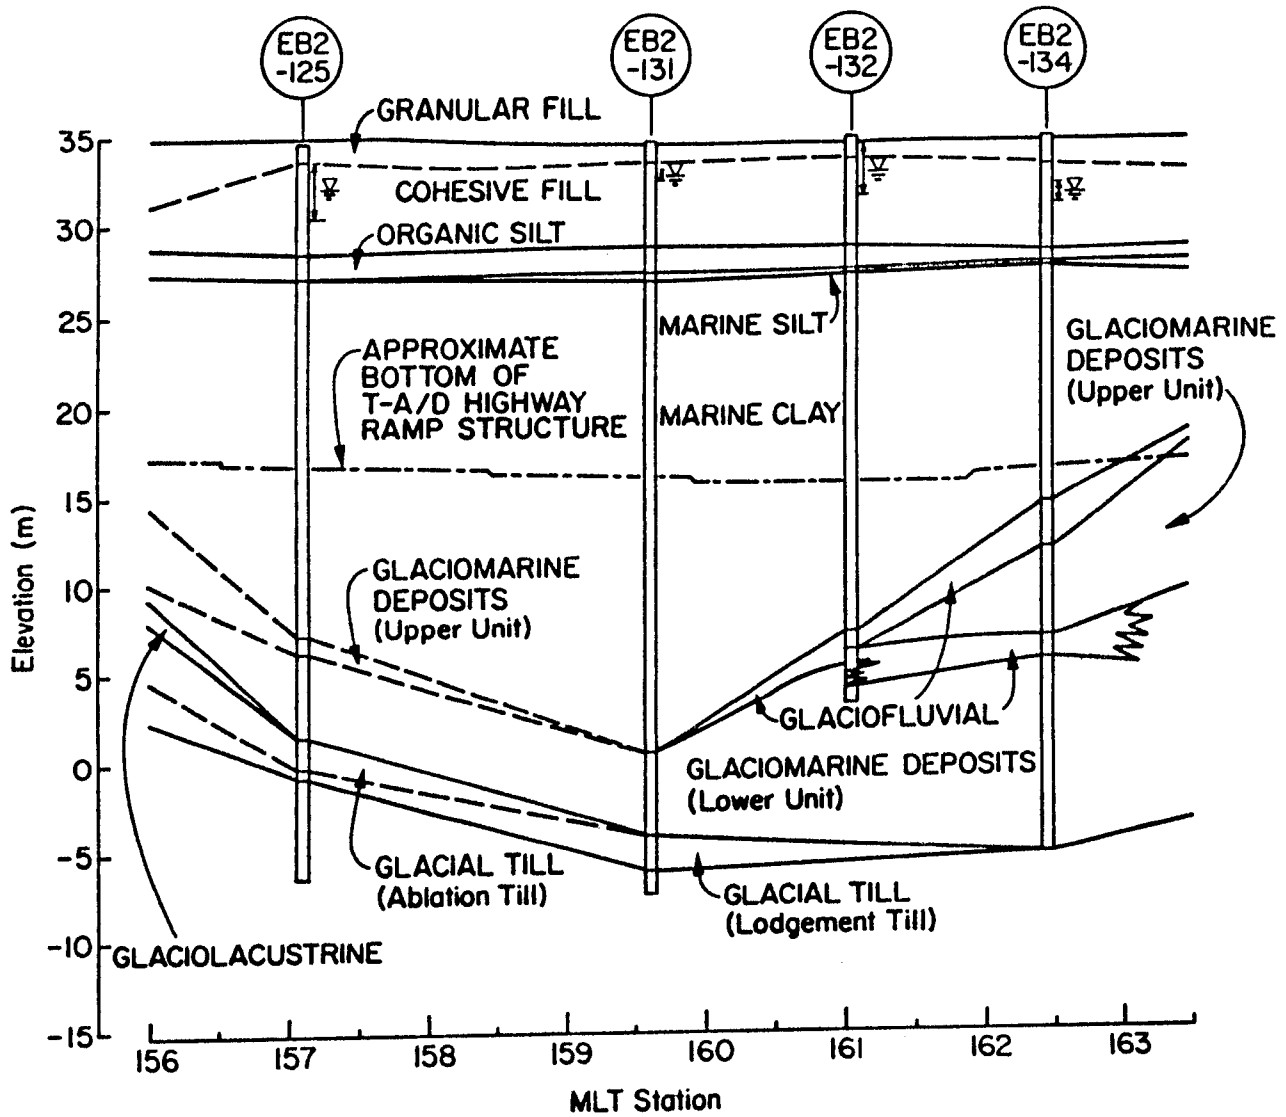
Longitudinal soil profile for MLT stations 156+00 to 163+00- east wall (O'Rourke et al., 1997, after Haley & Aldrich, Inc., 1991a).
